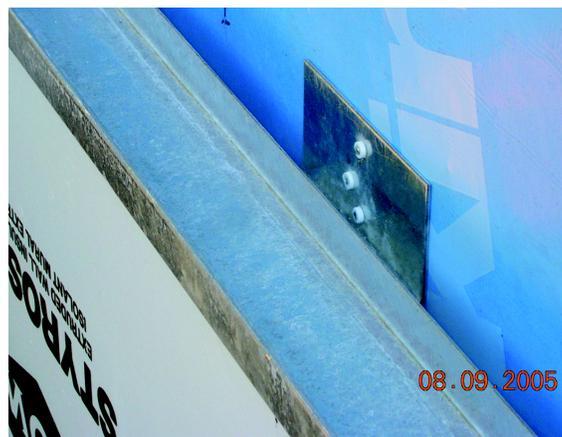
Light gauge steel cladding support over air and vapor barrier membrane on gypsum wallboard sheathing over light gauge steel framing.
